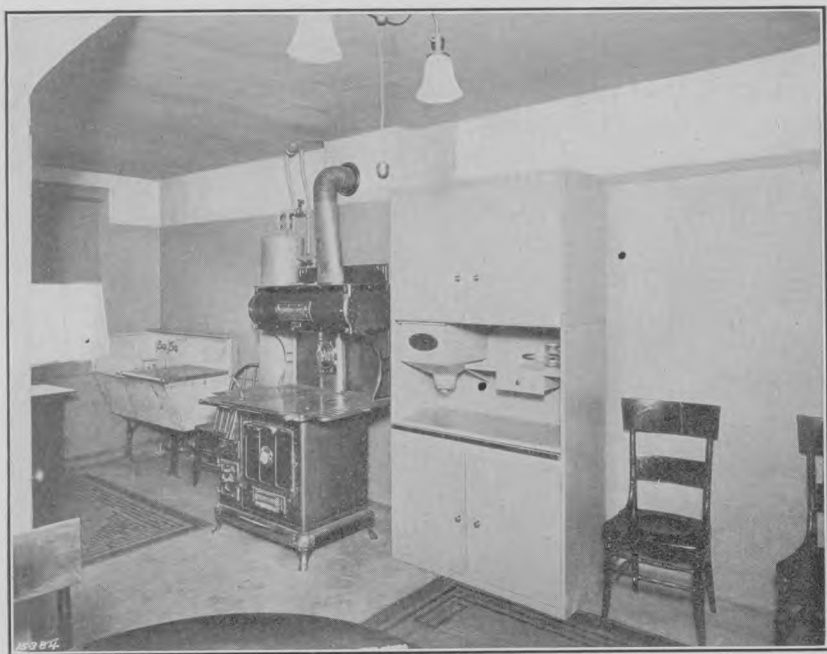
INTERIOR VIEW OF KITCHEN AND EQUIPMENT OF LOW-RENTAL HOUSES.
